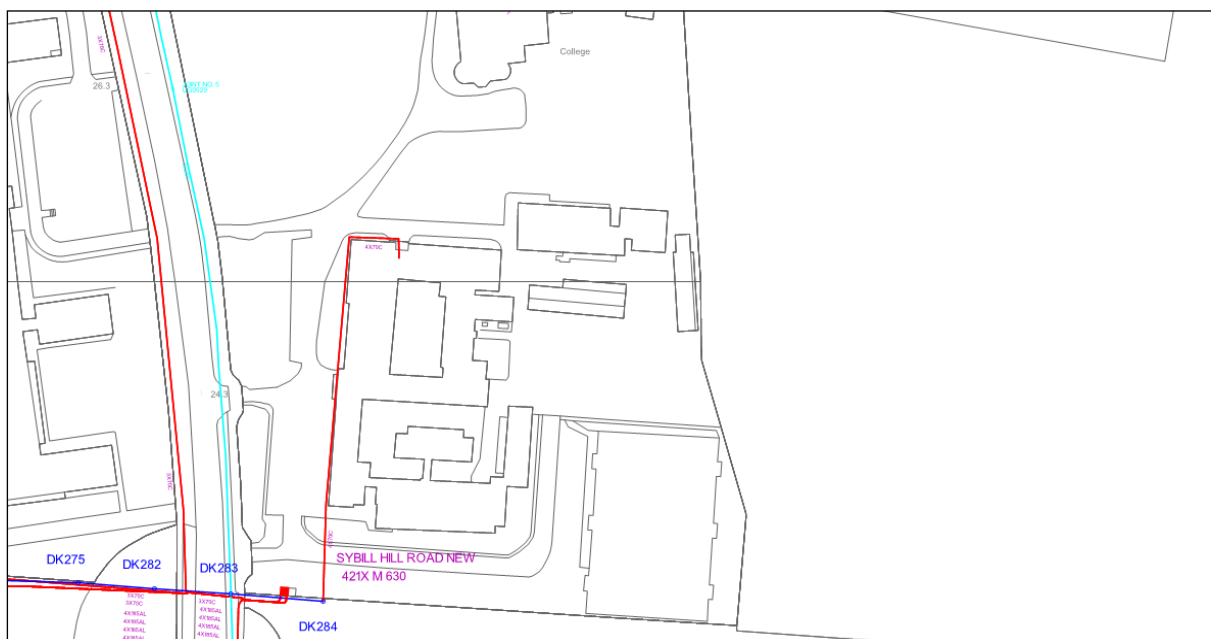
ESB Network Route Sybil Hill Road - St Anne's Park Avenue Junction (Source: ESB)
